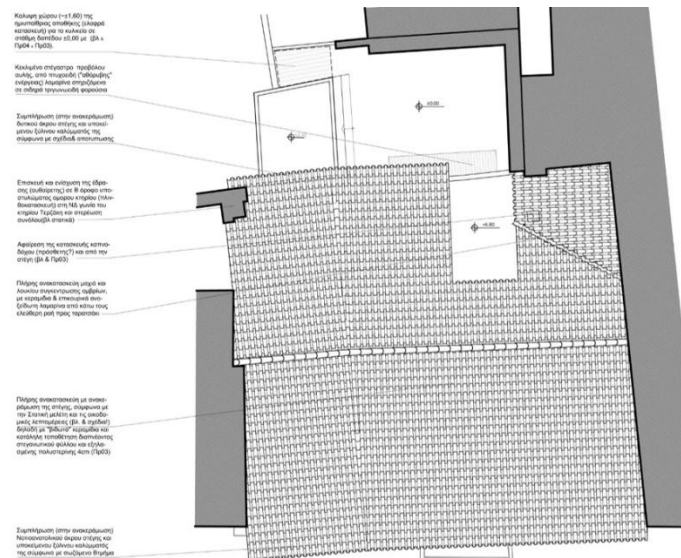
A full reconstruction with retiling of the roof planned, according to the Static study and the construction details i.e. with "screwed" tiles and proper placement of a breathable waterproofing sheet and 4cm extruded polystyrene
